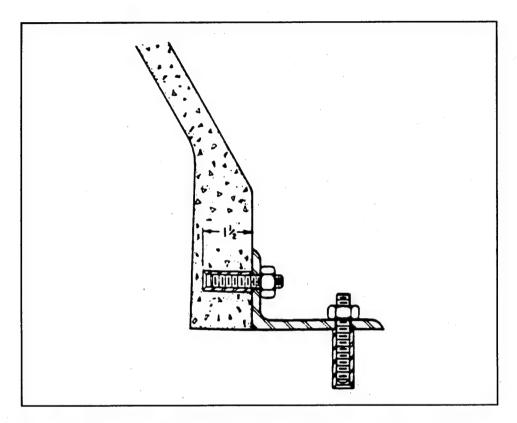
Cross section of anchoring system for precast concrete barrier shell on Pennsylvania Turnpike (from Barnaby and Dikeou 1984)
